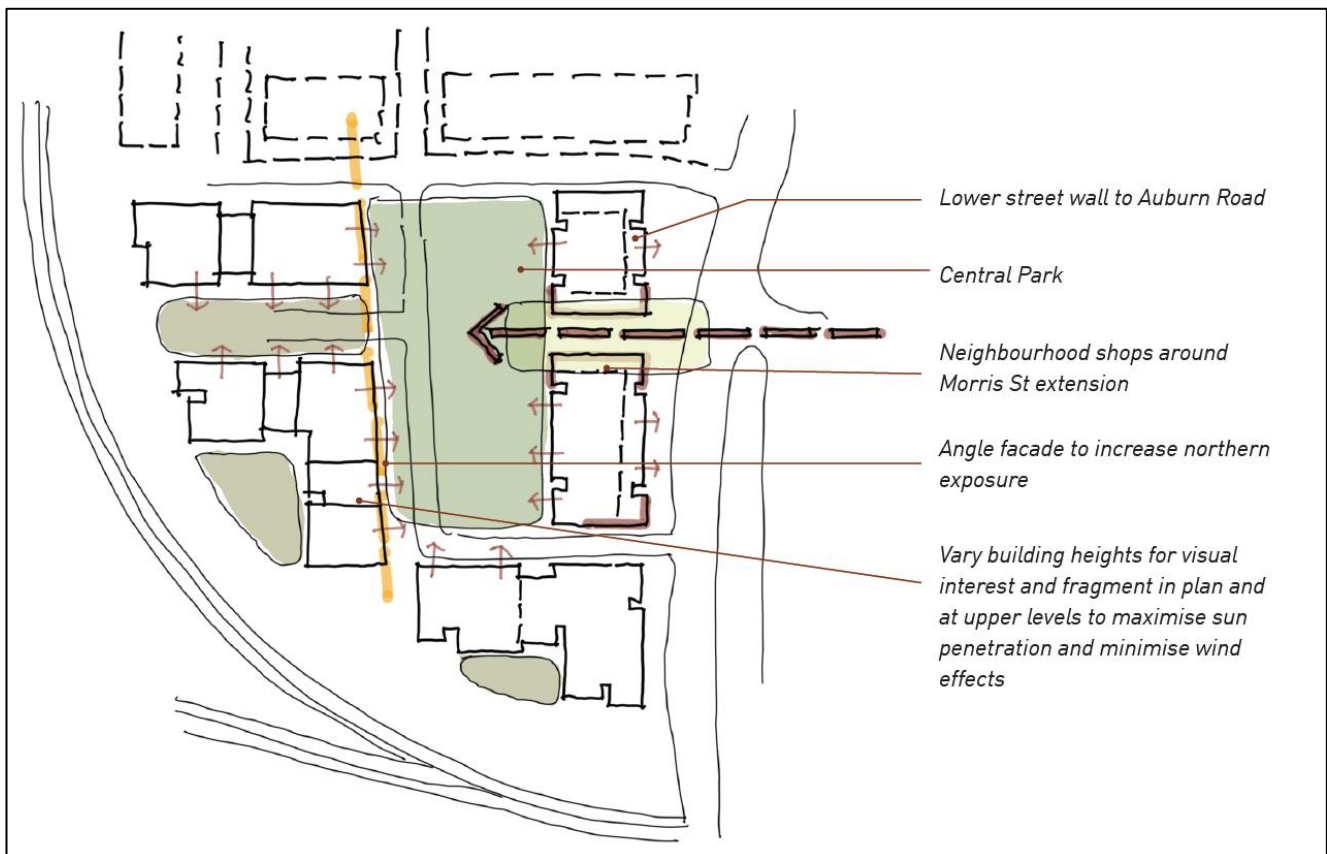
Revised Site Structure Plan (Smith & Tzannes)
